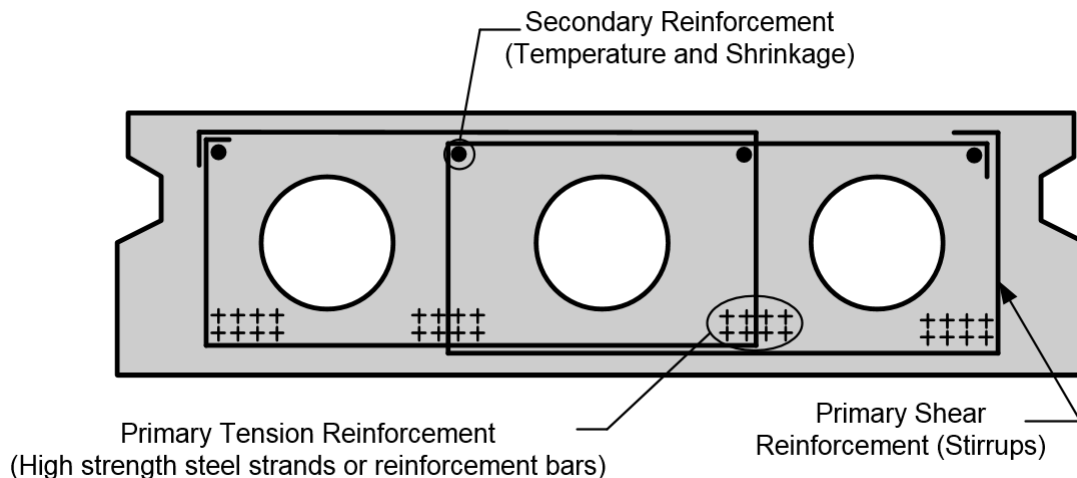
Steel Reinforcement in a Precast/Prestressed Slab Beam
